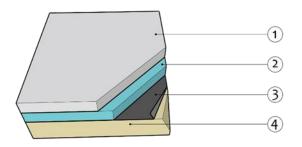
1. Reinforced concrete, 2. Insulation, 3. Damp proof membrane, 4. Compacted earth.
